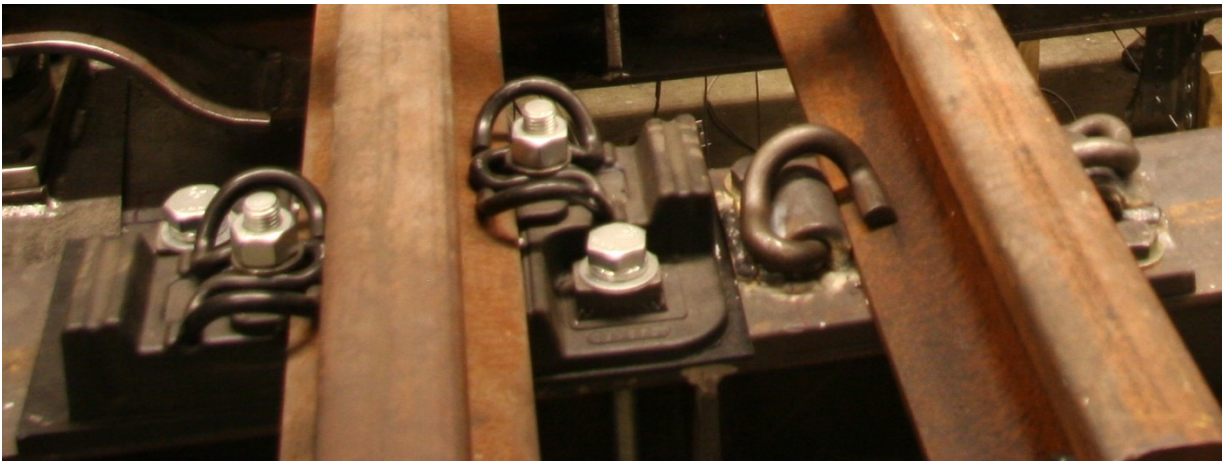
Photograph of the two rail fasteners used (*LEFT: DF fastener RIGHT: Weld on shoulder and “e” clip*).
